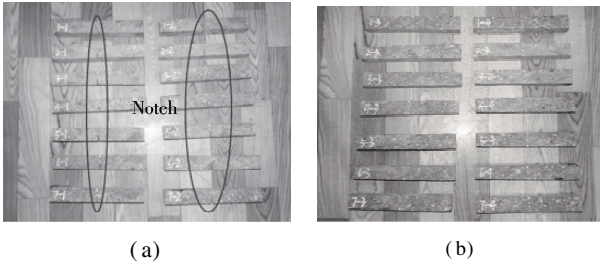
EAC Specimens. (a) Single-edge notched EAC beams; (b) EAC beams without notch
